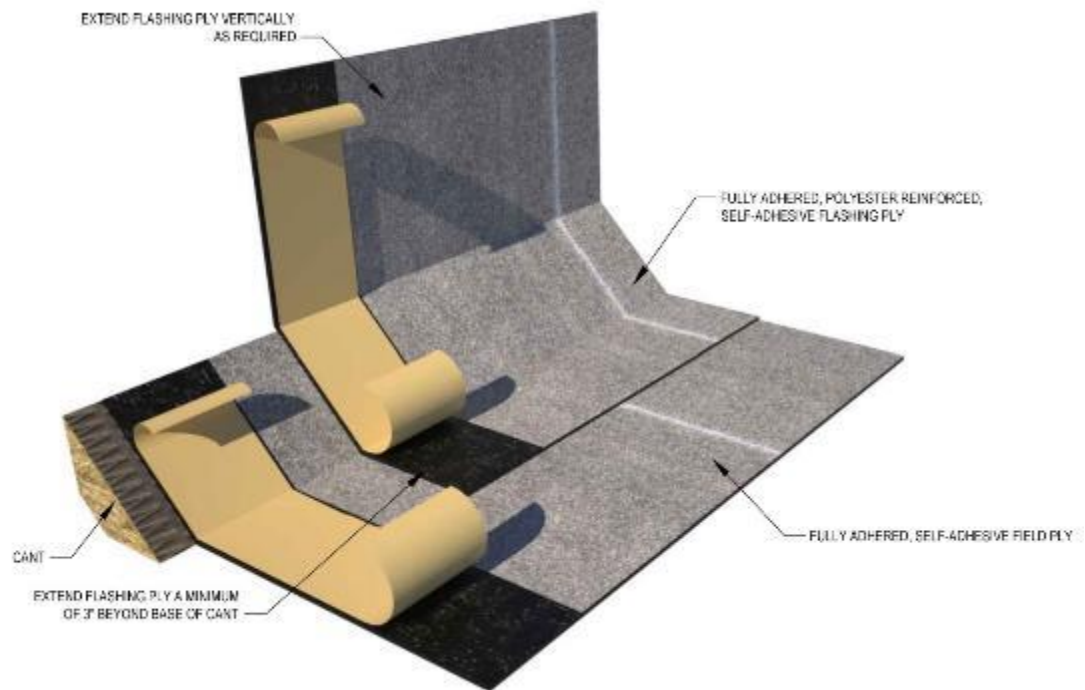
Fully Adhered, Self-Adhesive Vapor Retarder Flashing at Wall/Curb With Cant
